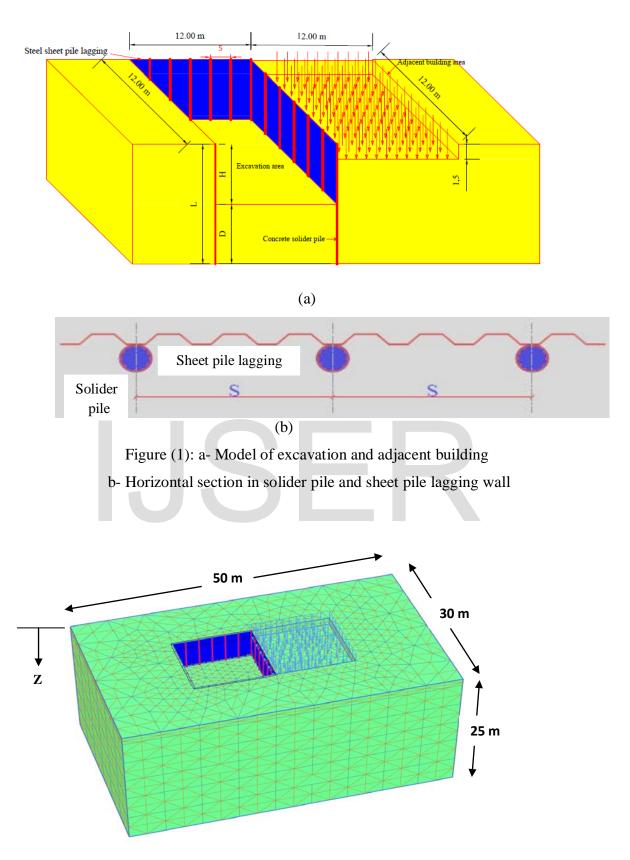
Finite element mesh for the model of deep excavation and adjacent building load
